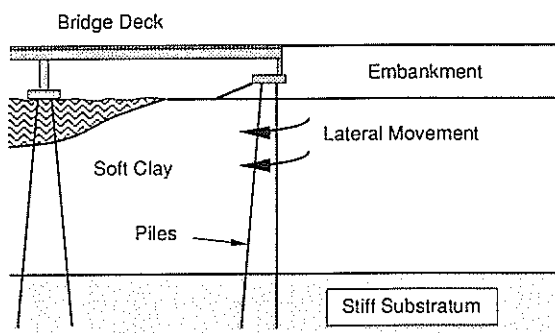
Piled bridge abutment subjected to horizontal soil movements
